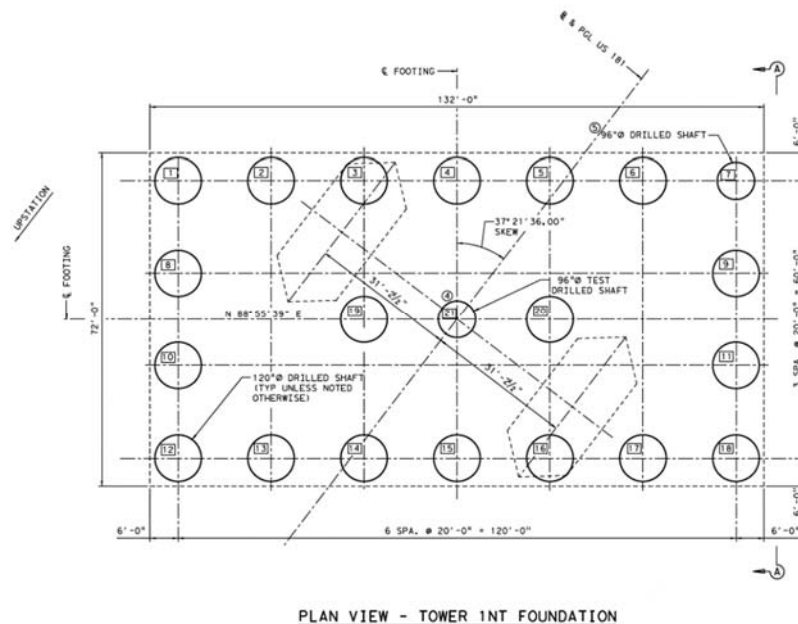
Foundation Cap 1NT, Foundation Cap and Shaft Layout, Drawing NHB-30A (by Others)
